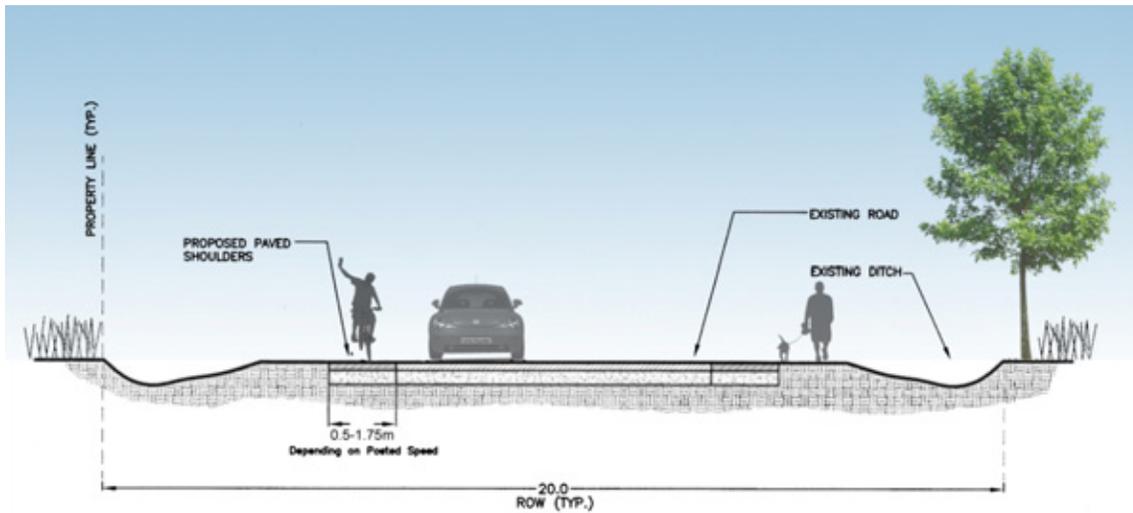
Cross Section of Rural Road with Paved Shoulders
